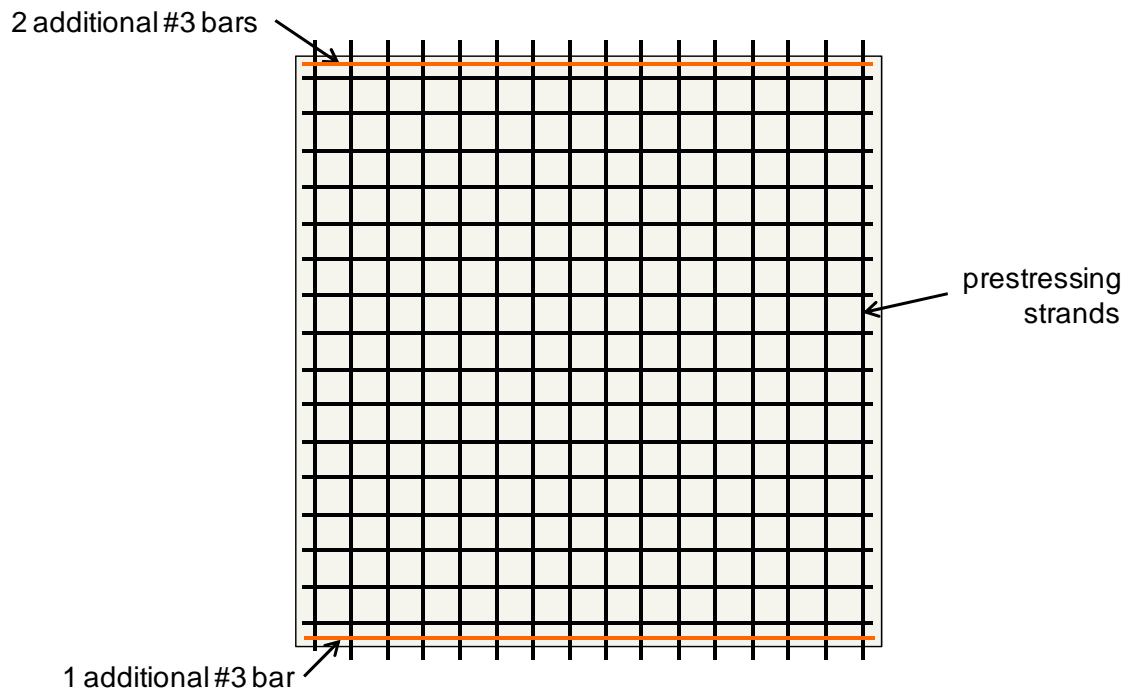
Plan view of reinforcement layout in panels M3, M4, and M5
